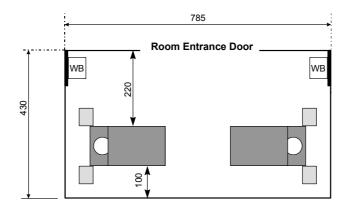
The architect's proposal for the layout of the new ICU rooms with two patient beds. Dimensions are in cm.
